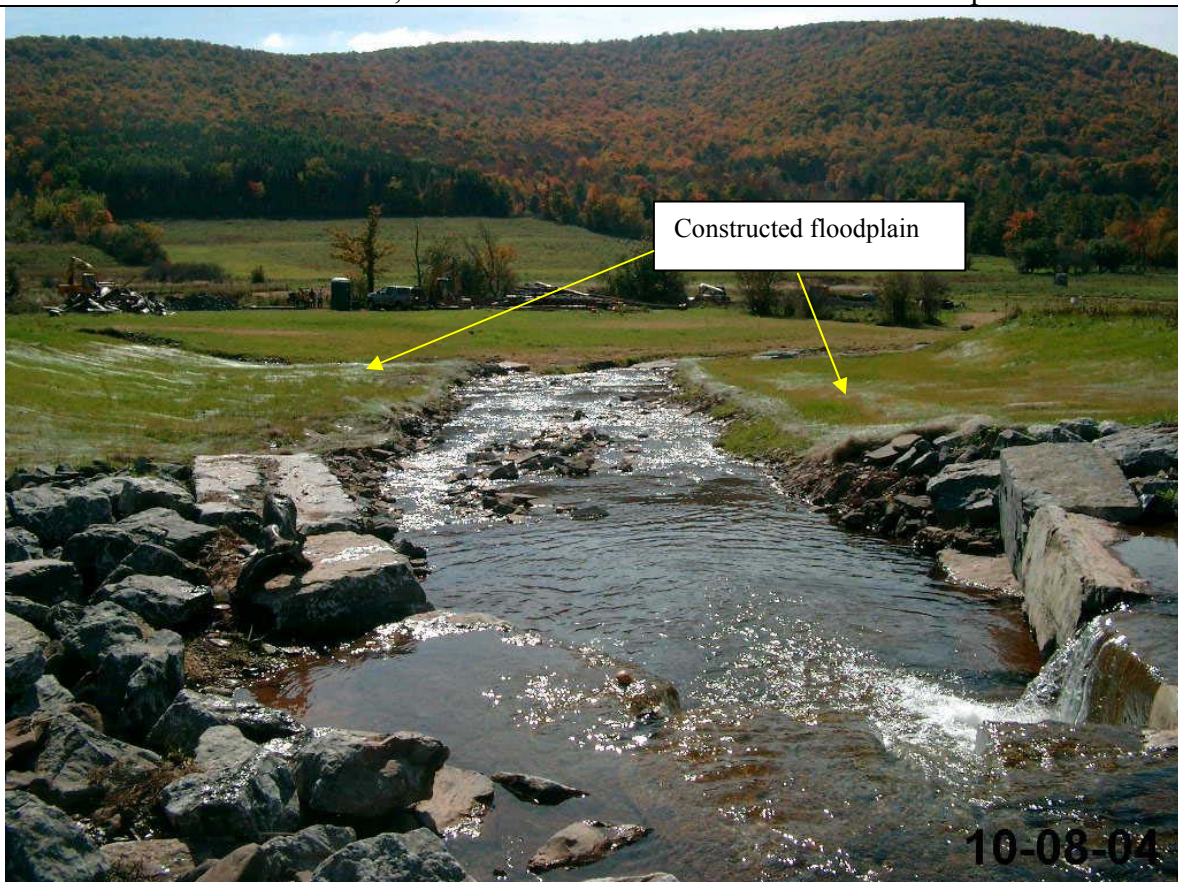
Just below the culvert with a newly constructed floodplain, 10-08-04.
